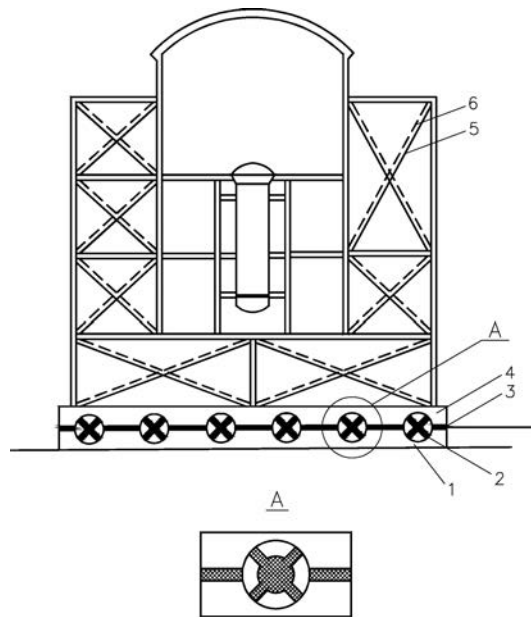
Basic scheme of reactor with seismic safety foundation and combined strengthening elements on the building frame: 1 is lower foundation plate; 2 are damping supports; 3 is sliding support; 4 is upper foundation plate; 5 are elastic-plastic ties; 6 are brittle-destructible ties [19].
